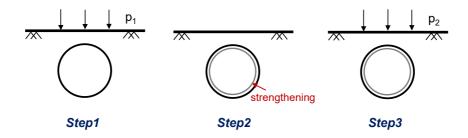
Test procedure for the steel plates strengthened segmental tunnel linings
